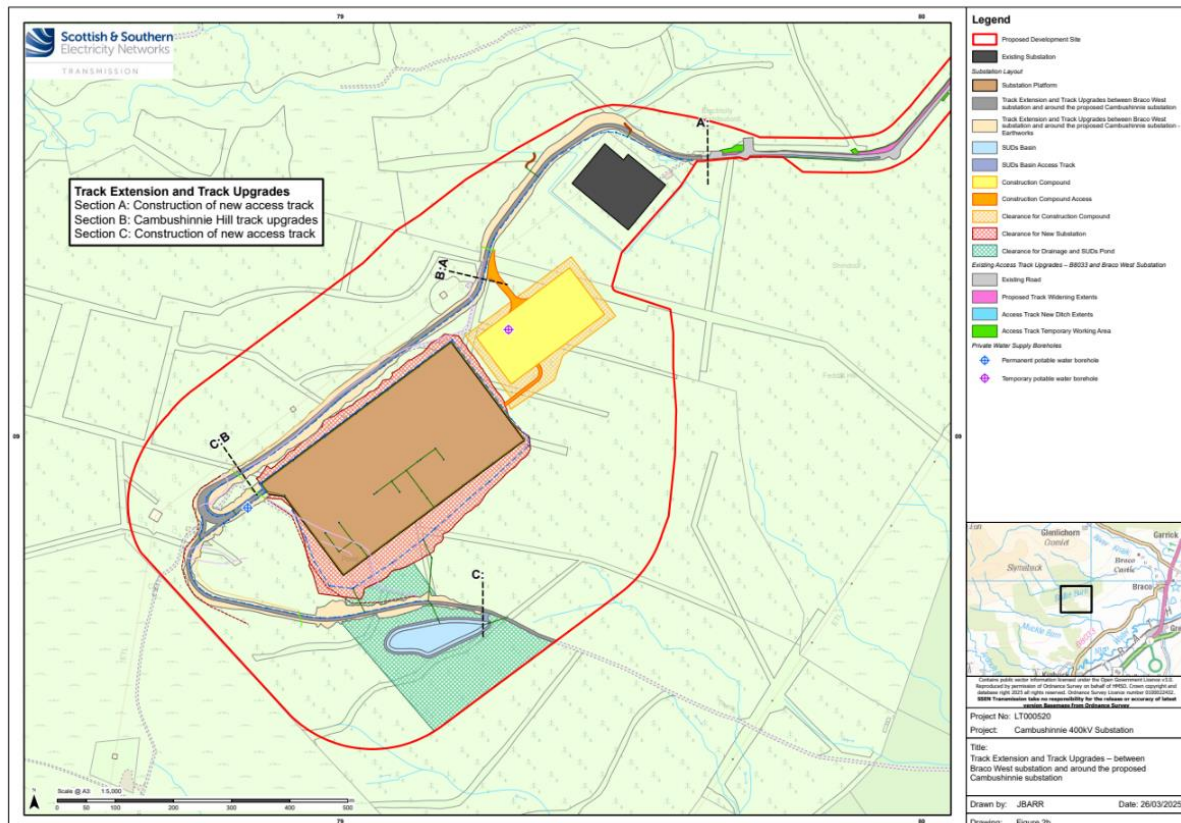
Site Location Plan: Proposed substation and track extension and upgrades
